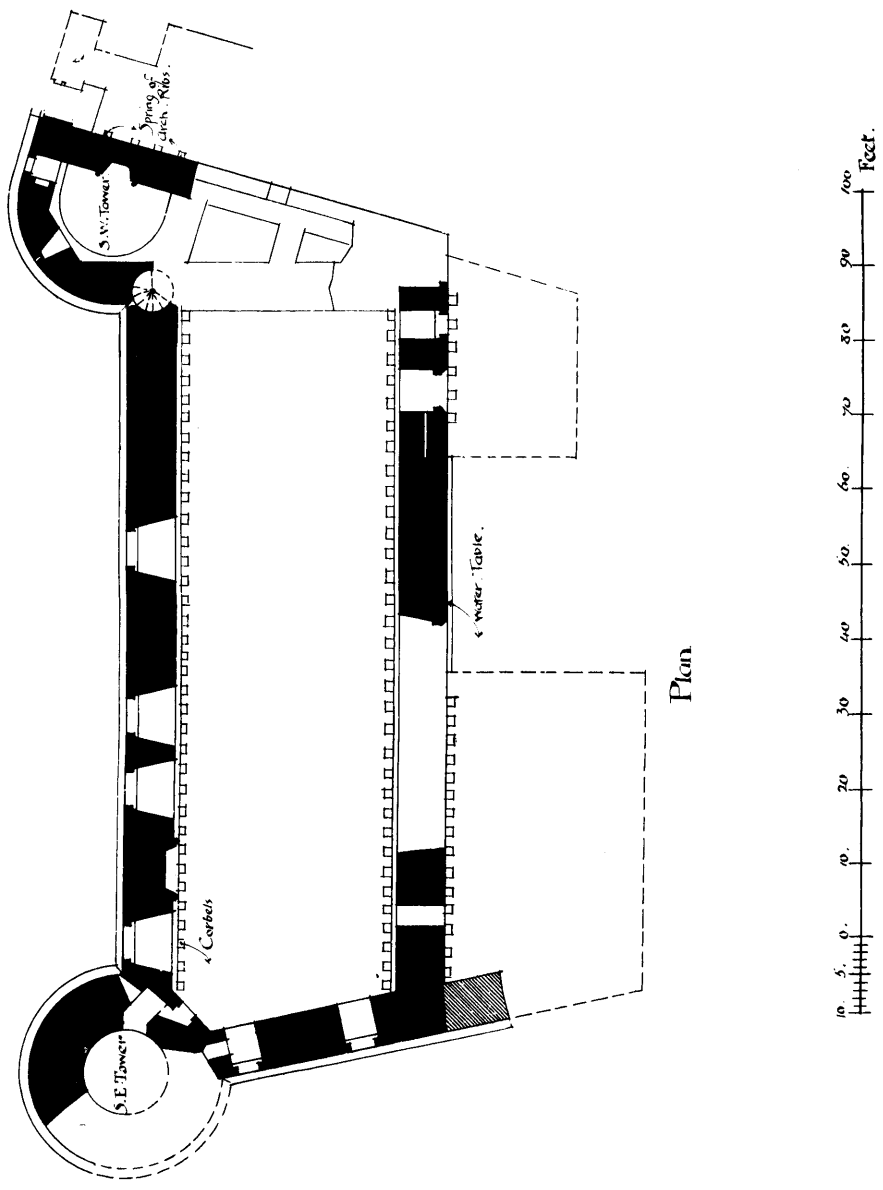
Morton Castle: plan of first floor by the late Robert Watson, Architect, Edinburgh.
